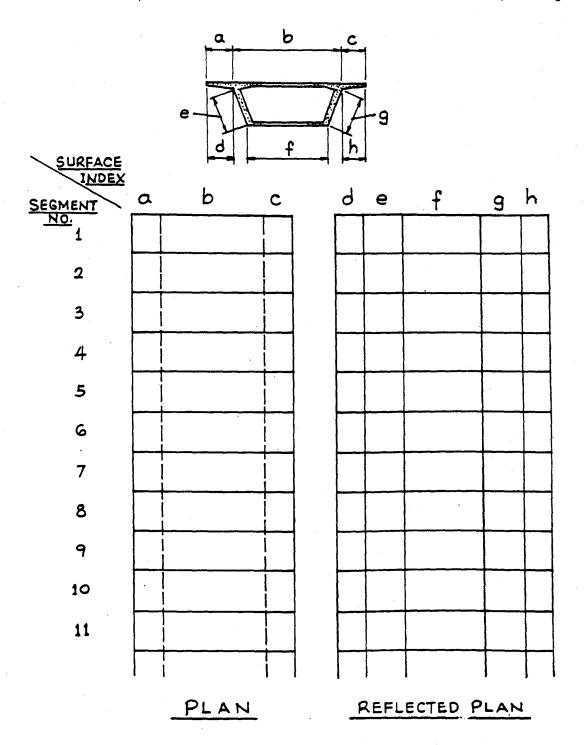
Form for Recording Cracks and Spalls in a Box Girder
